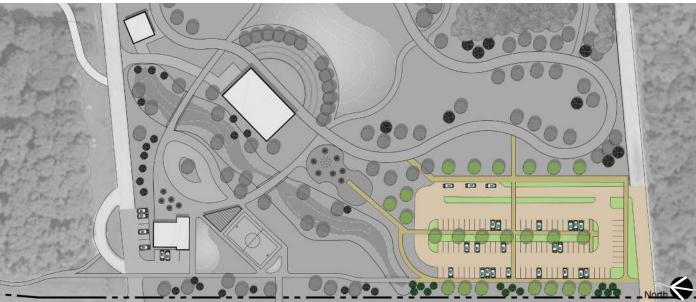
Master Plan Concept Design for Enhanced Parking Lot & Drop-Off
